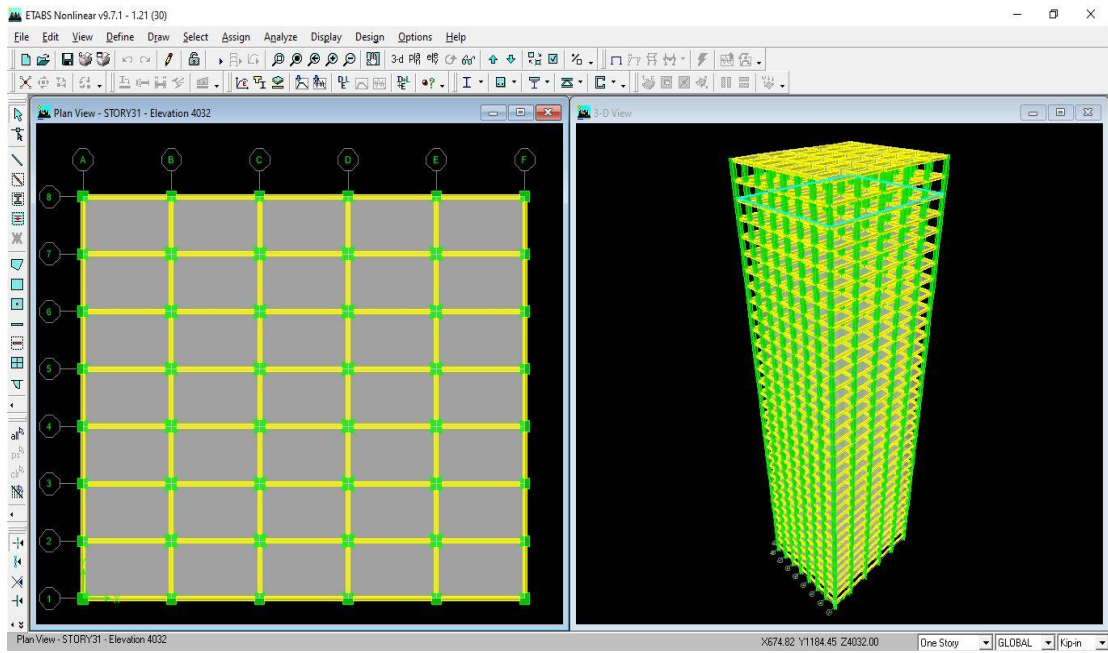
Plan and 3D view of 30 storied symmetric building of aspect ratio 1.21
